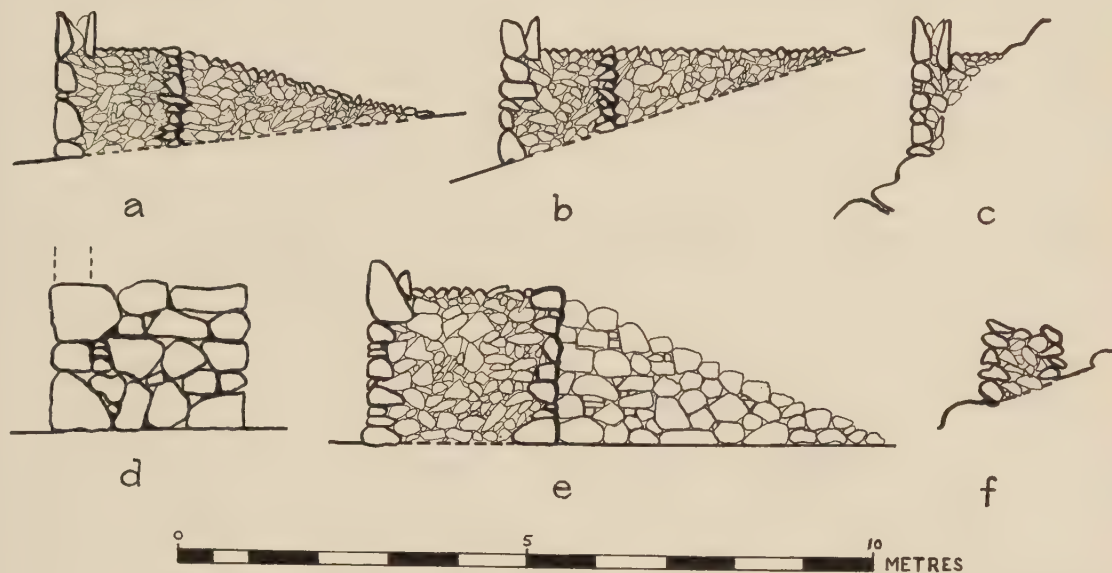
SCHEMATIC CROSS-SECTIONS OF WALLING
